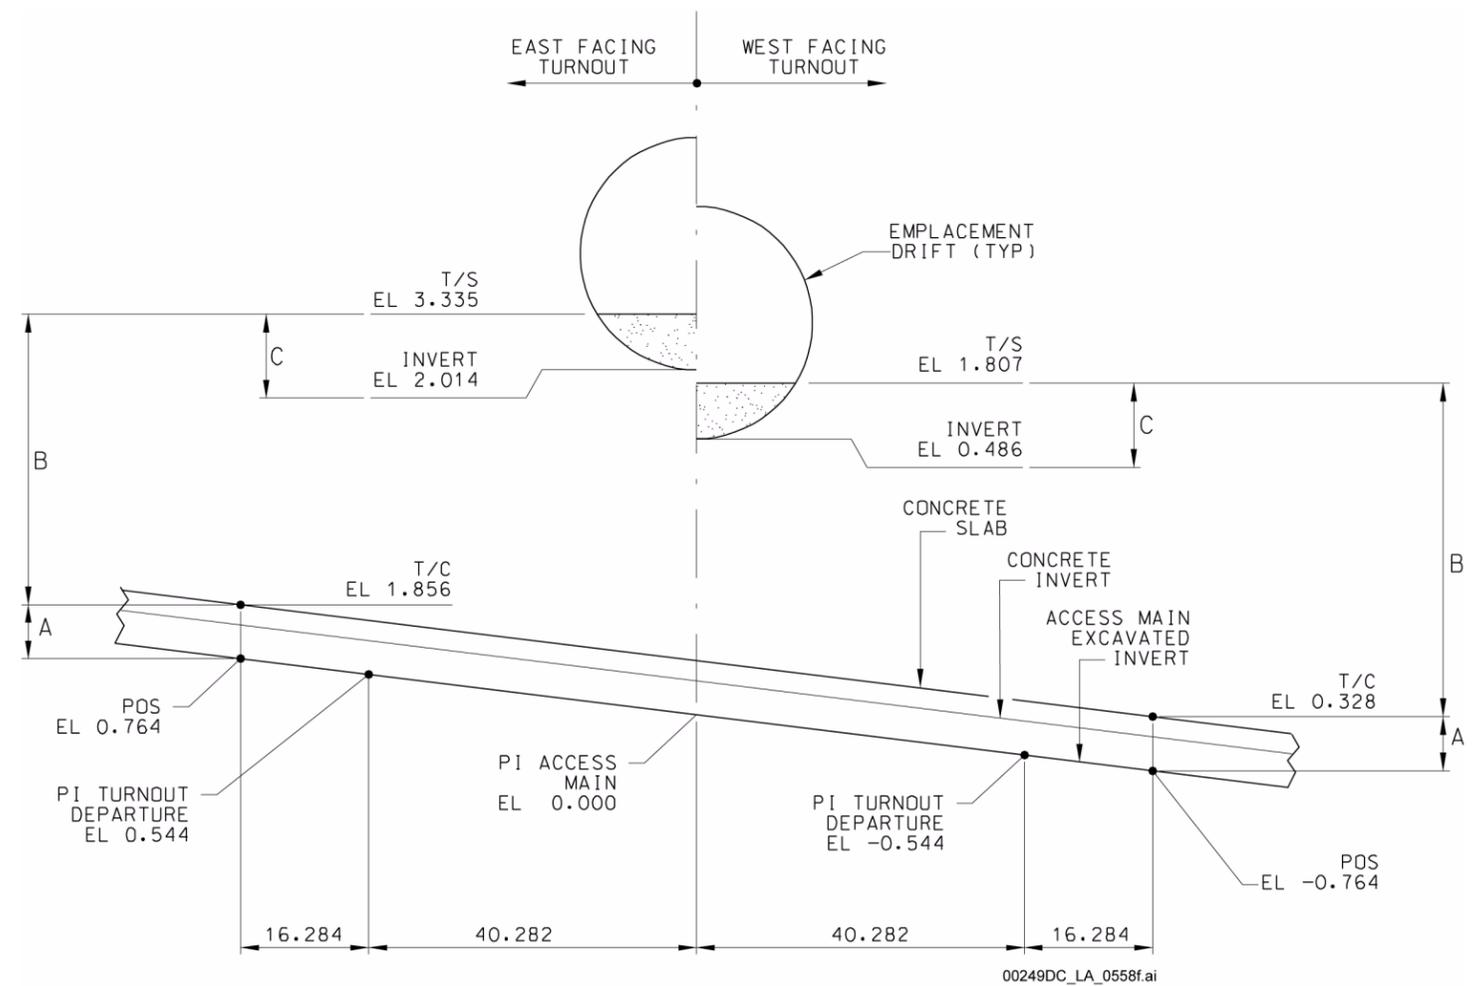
Representative Turnout Plan View and Sections
